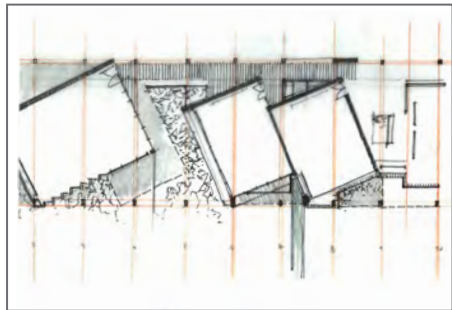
top: Keyplan indicating area of plan iterated through models & drawings (Author, 2017).
